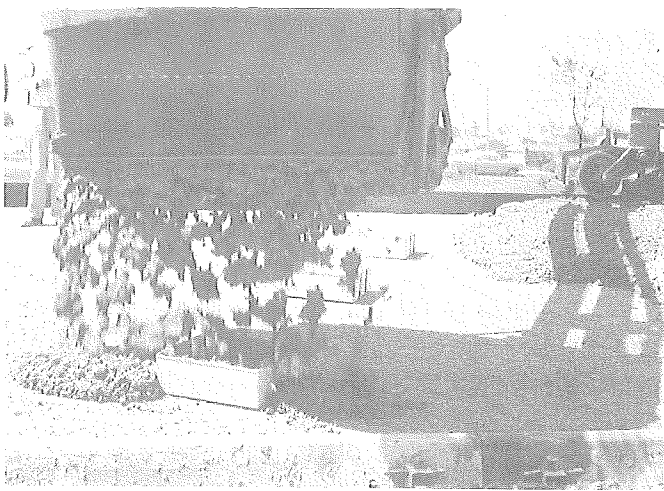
Depositing the Concrete From the Paver Bucket Into the First Collecting Pan.
